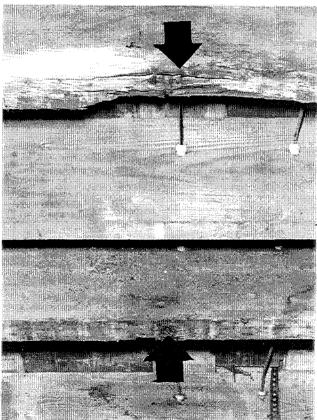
1851 COTTAGE CEILING JOISTS AT ROOM 103
